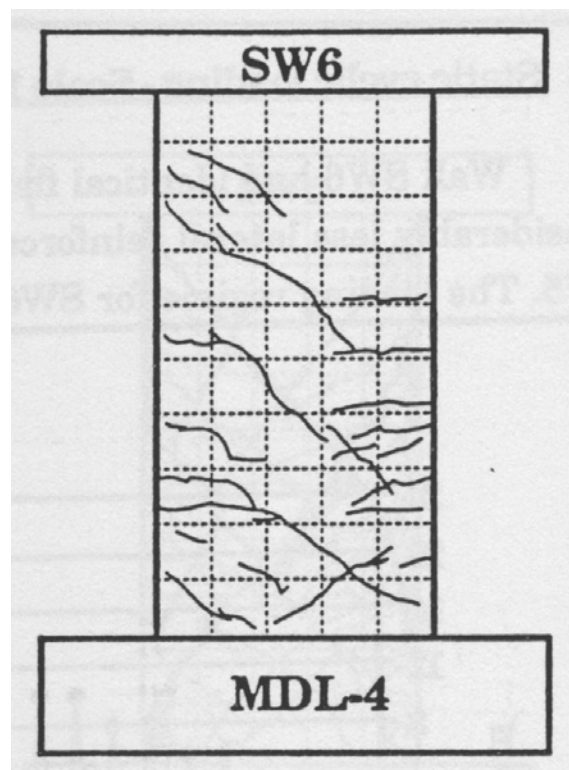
Condition of wall SW6 at 0.33% drift [Pilakoutas (1991)]
